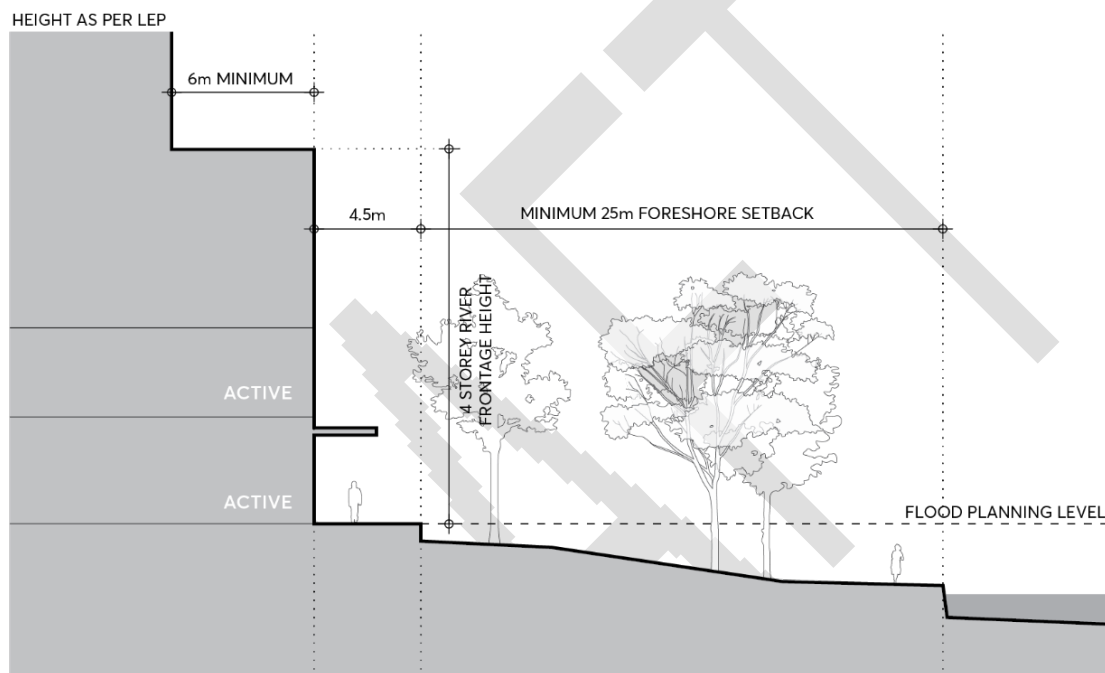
City East Block Typical River Frontage (Section A)
